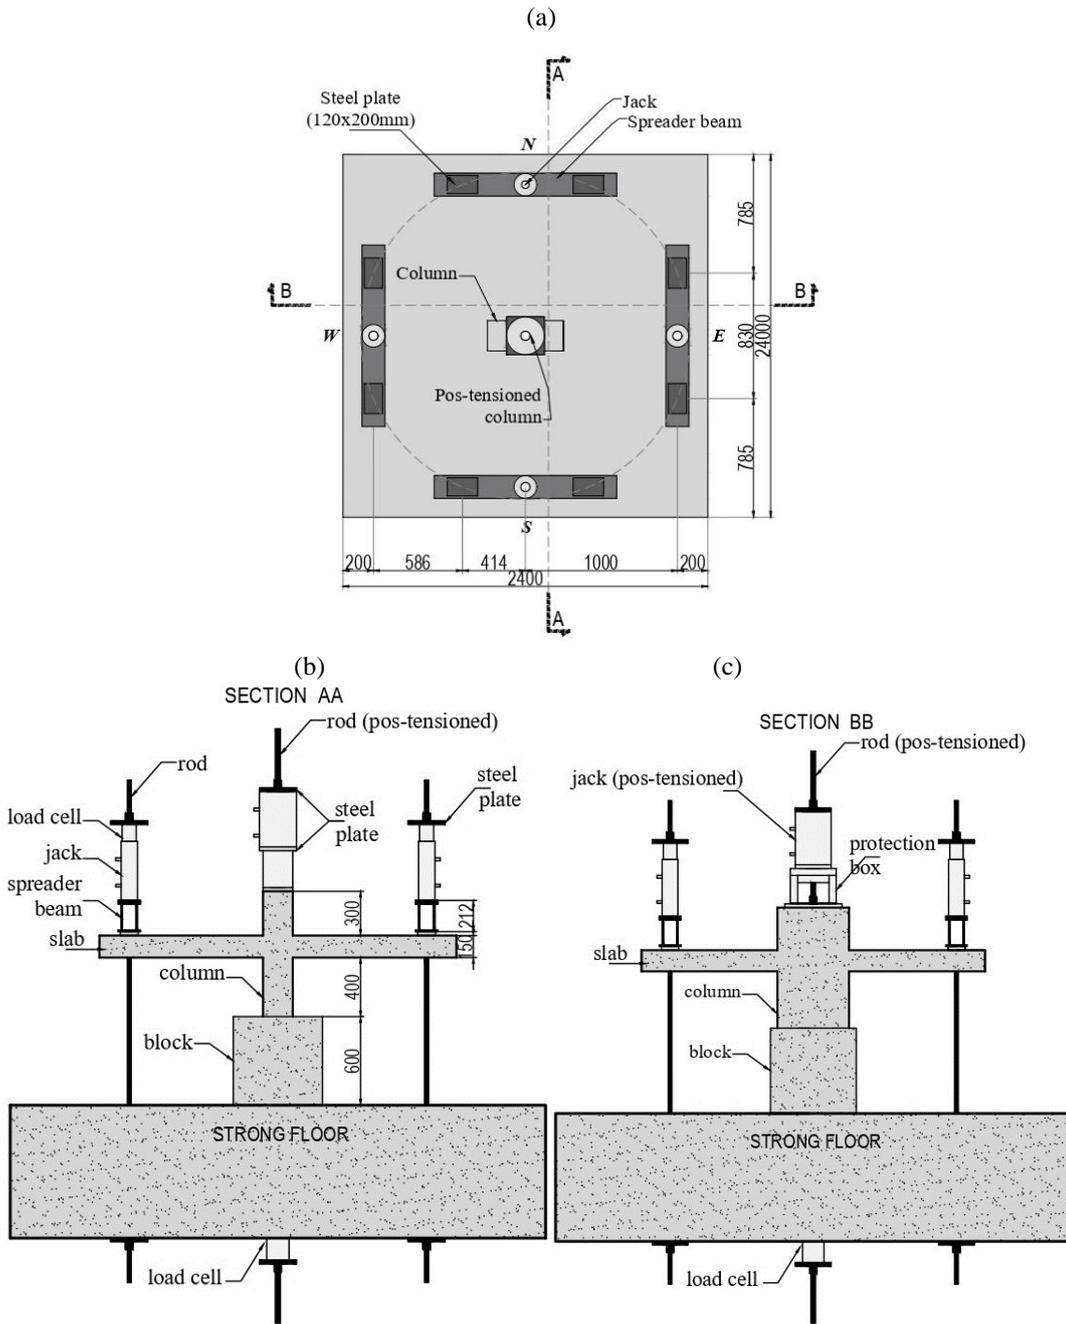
Tests setup (a) Plain view (b) Section A-A (c) Section B-B
